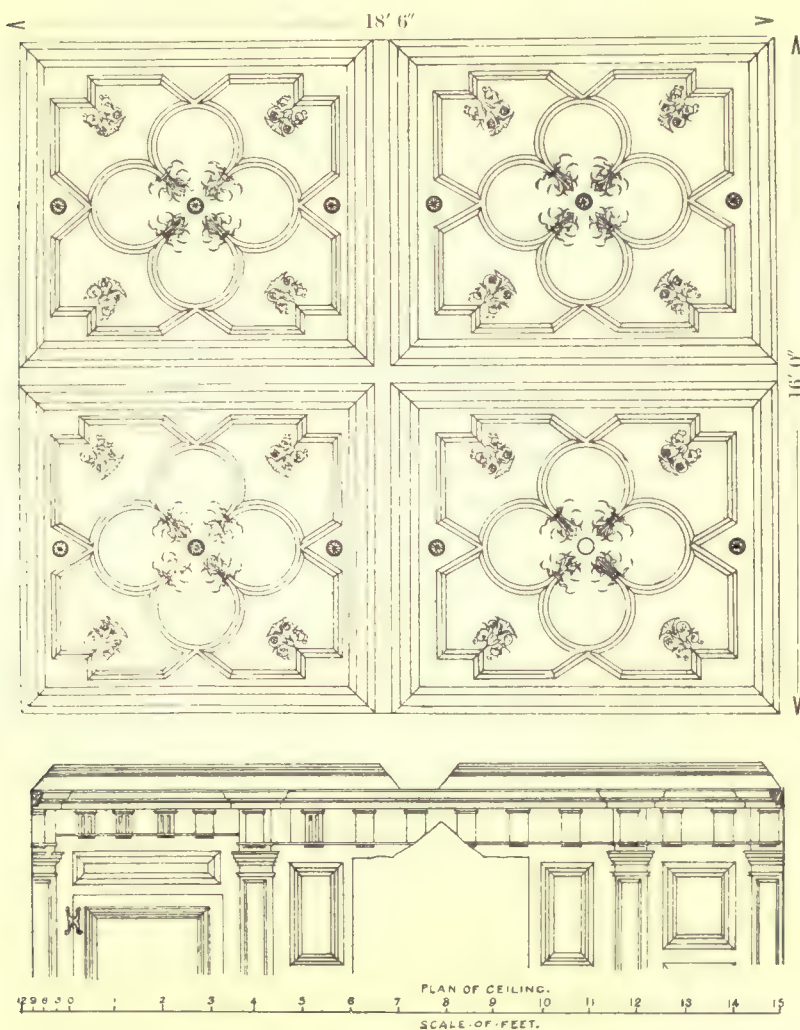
Plan of First-Floor Room over Gateway, Haddon Hall, Derbyshire.
